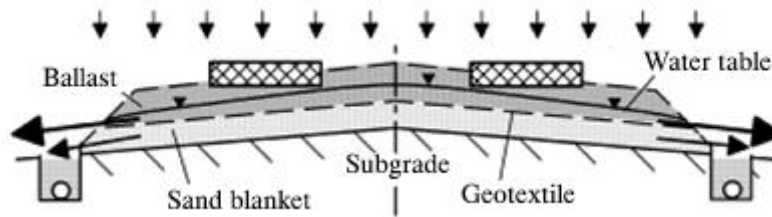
Drainage with permeable geotextile below ballast in railway track, from Rushton & Ghataora (2014)
